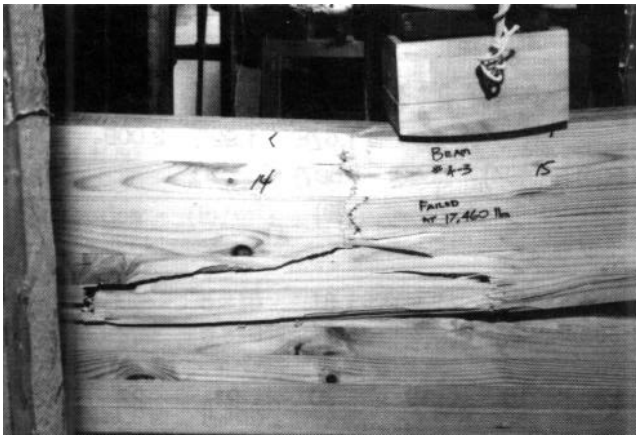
Compression-type failure in 10-lamination beam. (M91-0166-3)
